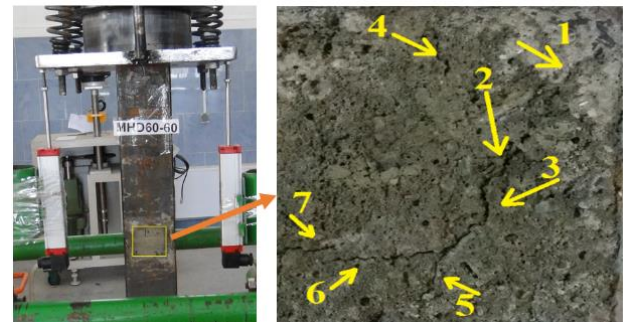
Concrete (mortar) cracking in CFST column having horizontal deficiency
